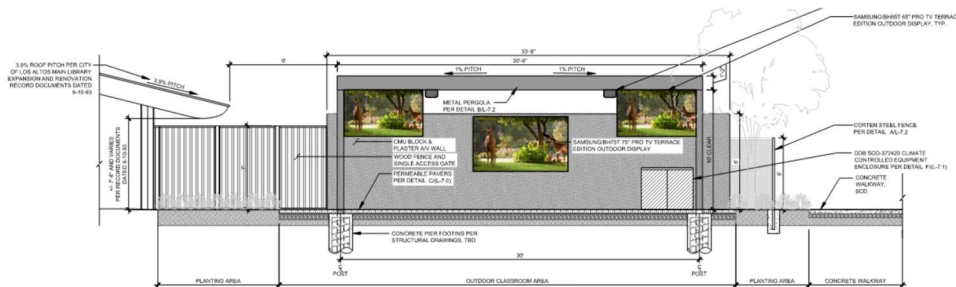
Elevation of the wall at the pergola of the proposed project, revised drawings dated 12/10/2024 (SSA Landscape Architects).
